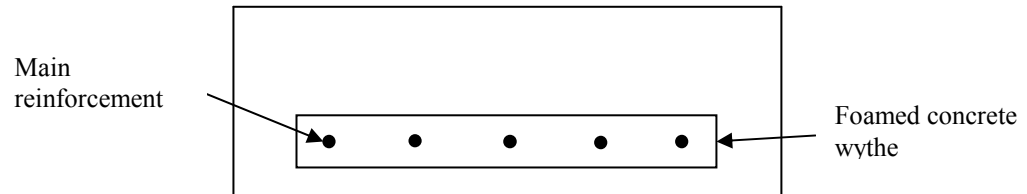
Placement of the first layer of foamed concrete wythe and the main reinforcement
